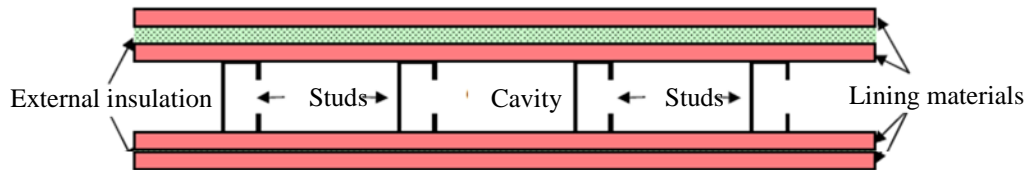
CFS wall systems with exterior insulation (Chen & Ye, 2013)
